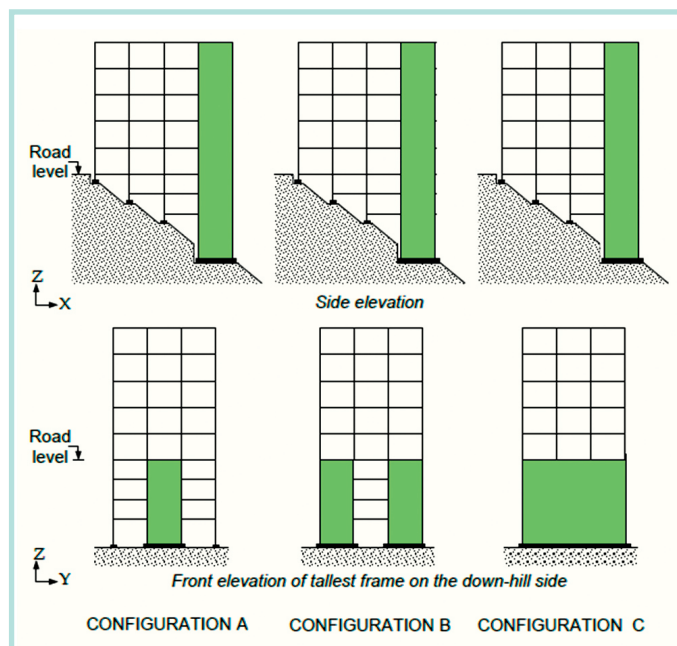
Shear Wall Configurations for Buildings on Slope^[2] (Table 9)
